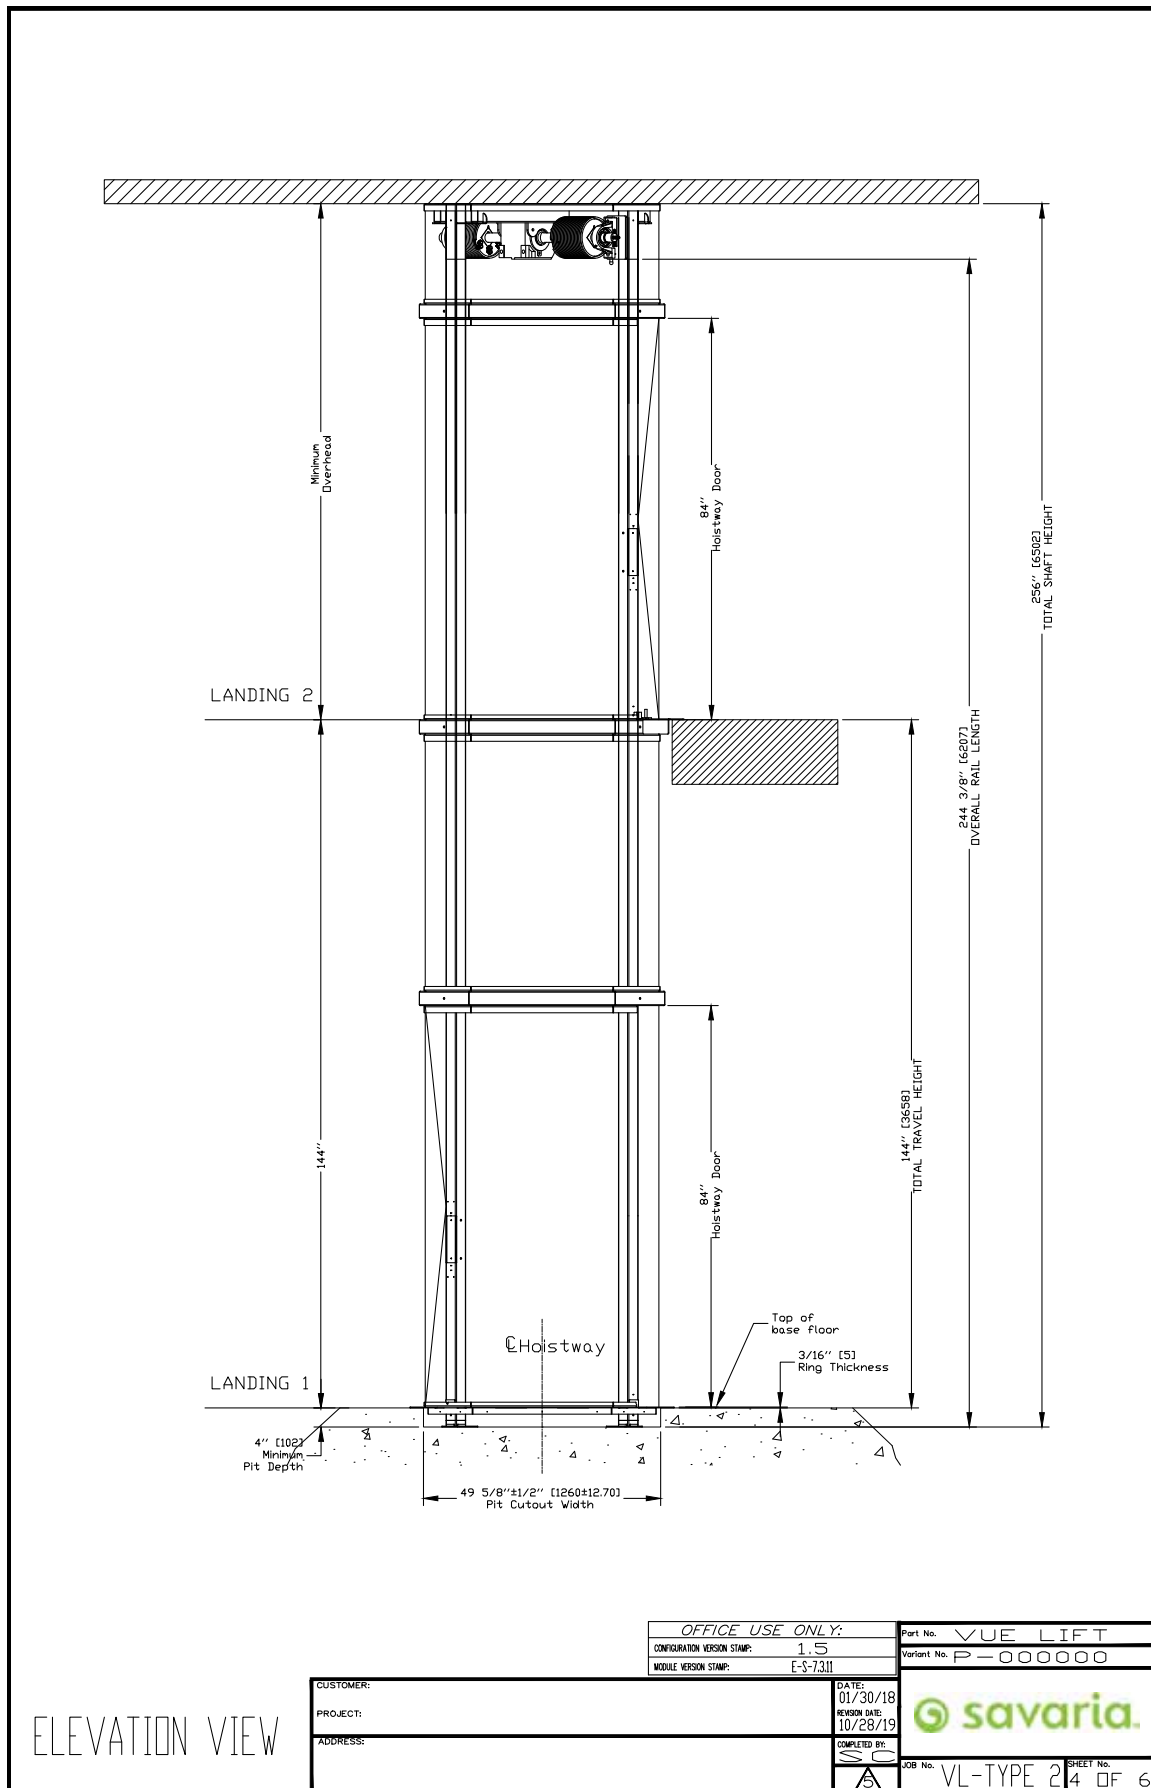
Elevation view (OGM, type 2) - extra header rings if floor-to-floor height &gt; 14 ft
